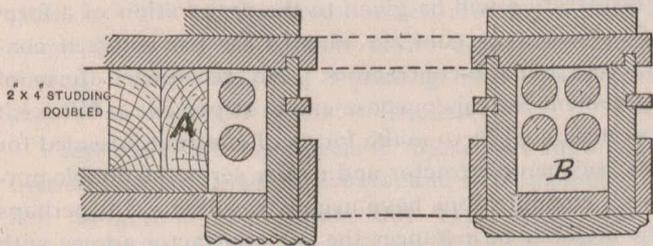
SECTION THROUGH WINDOW FRAME. Scale, 1 1/2 Inches to the Foot.
